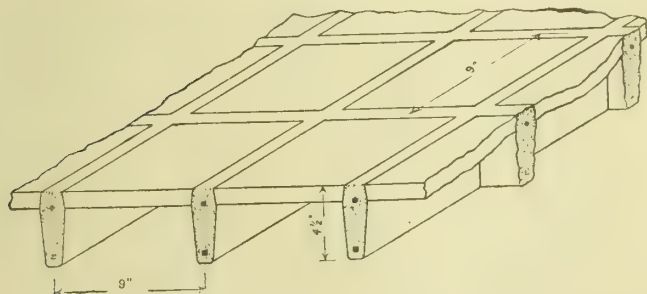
DETAIL OF "BRUNER" SKYLIGHT CONSTRUCTION
